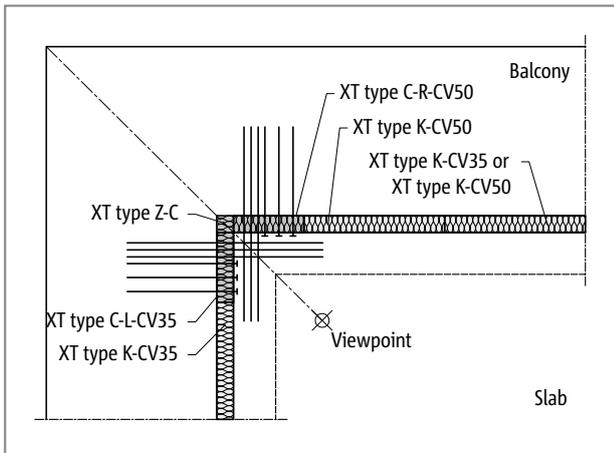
Schöck Isokorb® XT type C: Balcony with outer corner freely cantilevered (application XT type C-L-CV35, XT type C-R-CV50)
